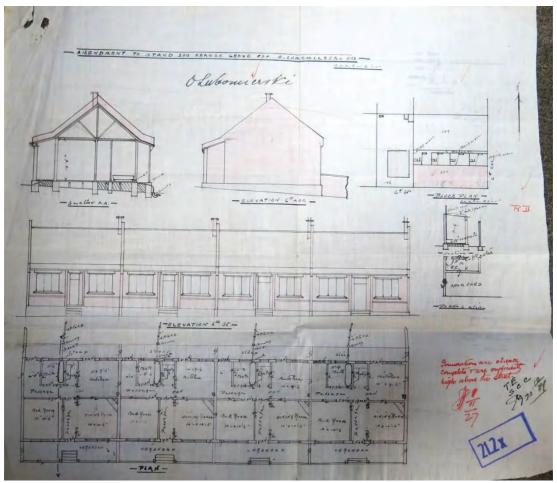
Amendment to Stand 200, Orange Grove Four attached row houses with main elevations to 6<sup>th</sup> Street were designed and built in 1927 (Source: City Council of Johannesburg, Plans Archive)
